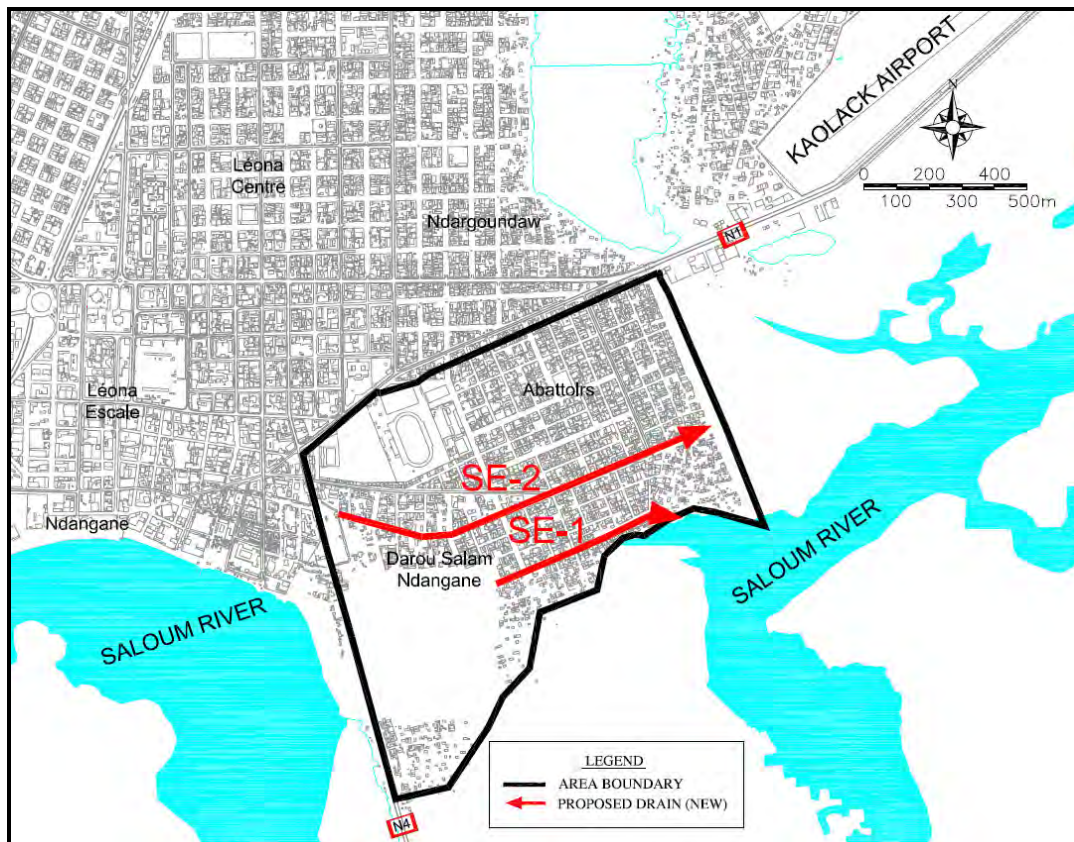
Location of Proposed Drainage Facilities for South East Area
